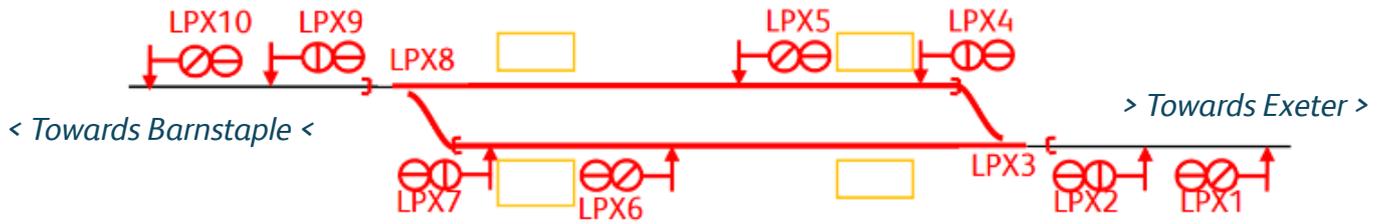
(From ESDD PACE A report) Proposed passing loop arrangement for Morchard Road to Lapford and Kings Nympton to Portsmouth Arms, with signalling.
